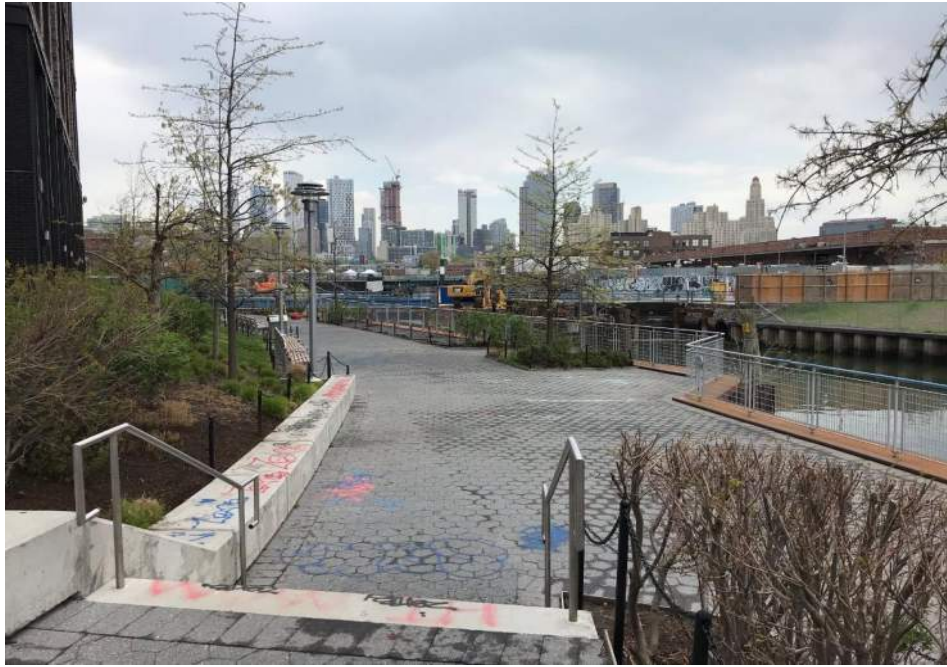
Paved and landscaped esplanade areas, facing east. 21 April 2021.
